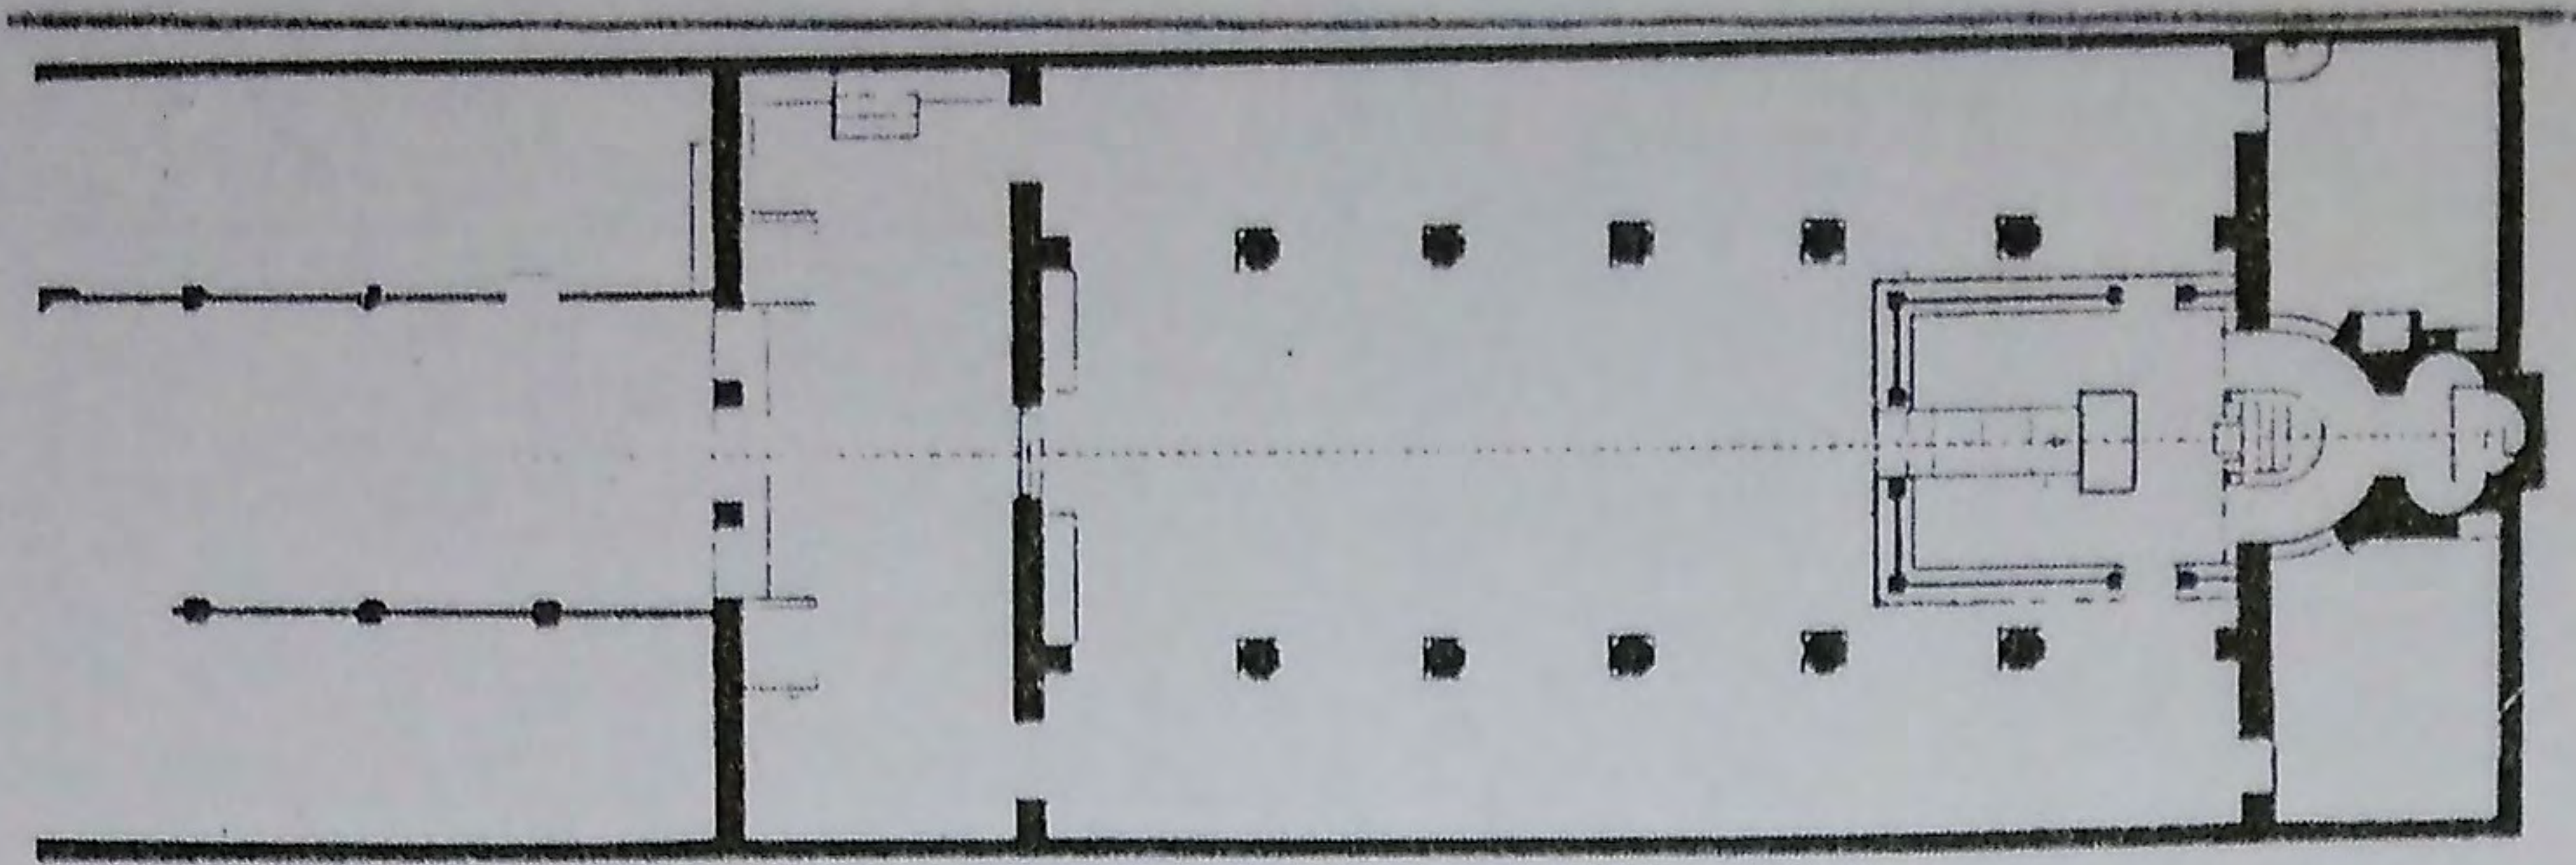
Plan of The Town Church in Tell Mahrad - Wadi Firan .
